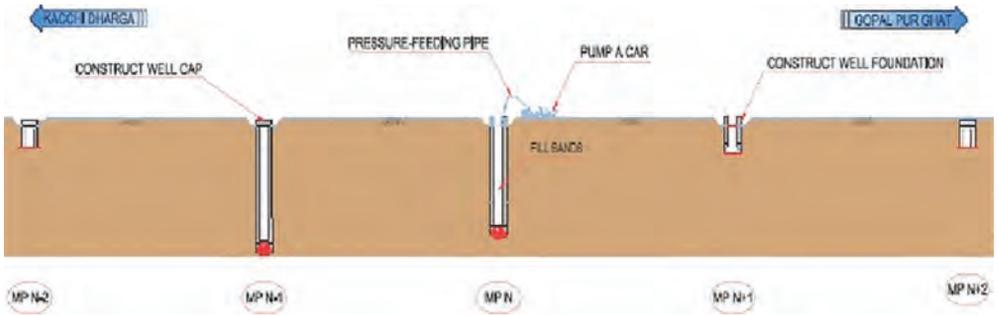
Construction of caisson foundation (sinking and concreting for steining is a staggered process)
